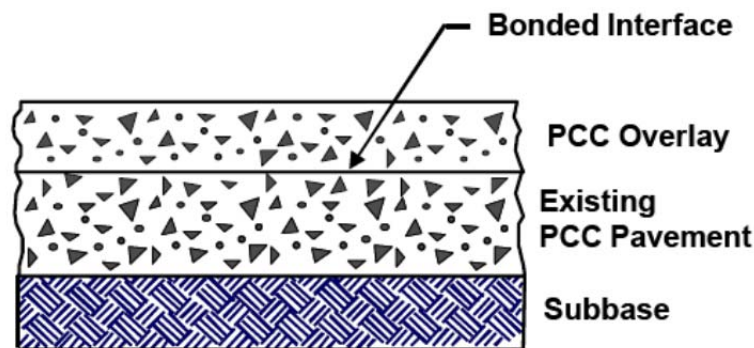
Typical cross section of a bonded PCC overlay (McGhee, 1994).
